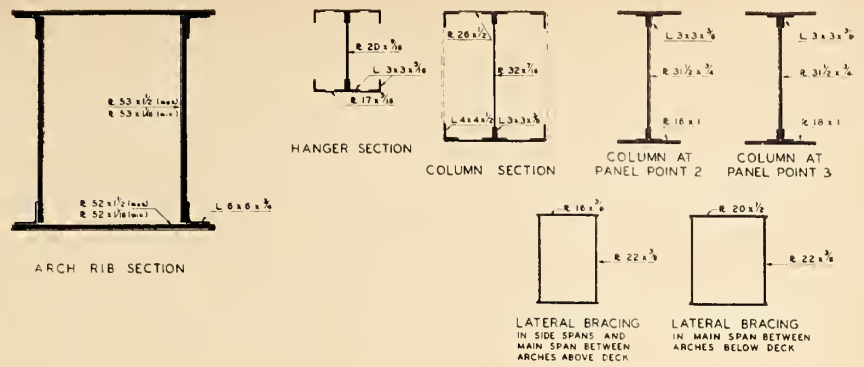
Cross sections of arch ribs, verticals and bracing members.
